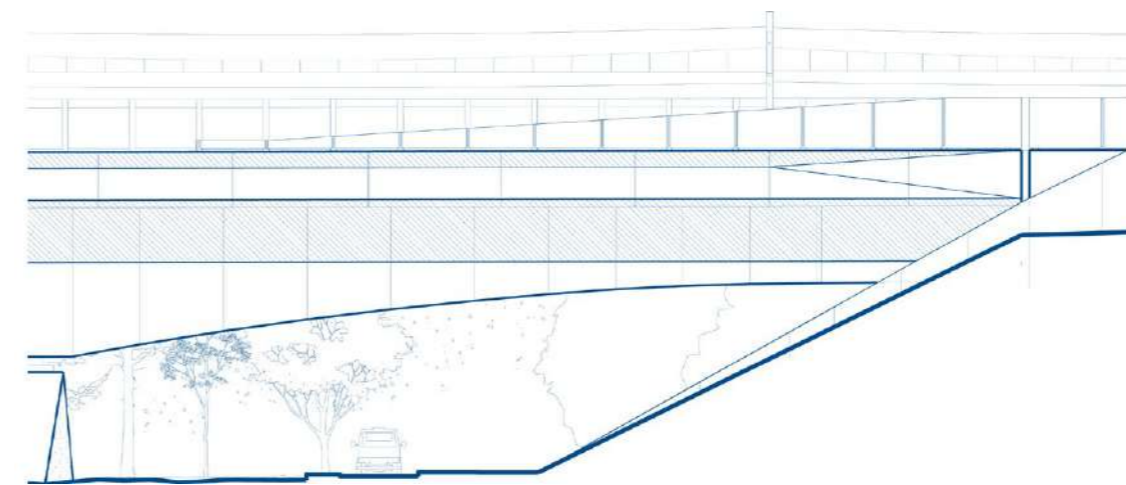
\_ Proposed Elevation - 1.65m opaque to 4m opaque transition
